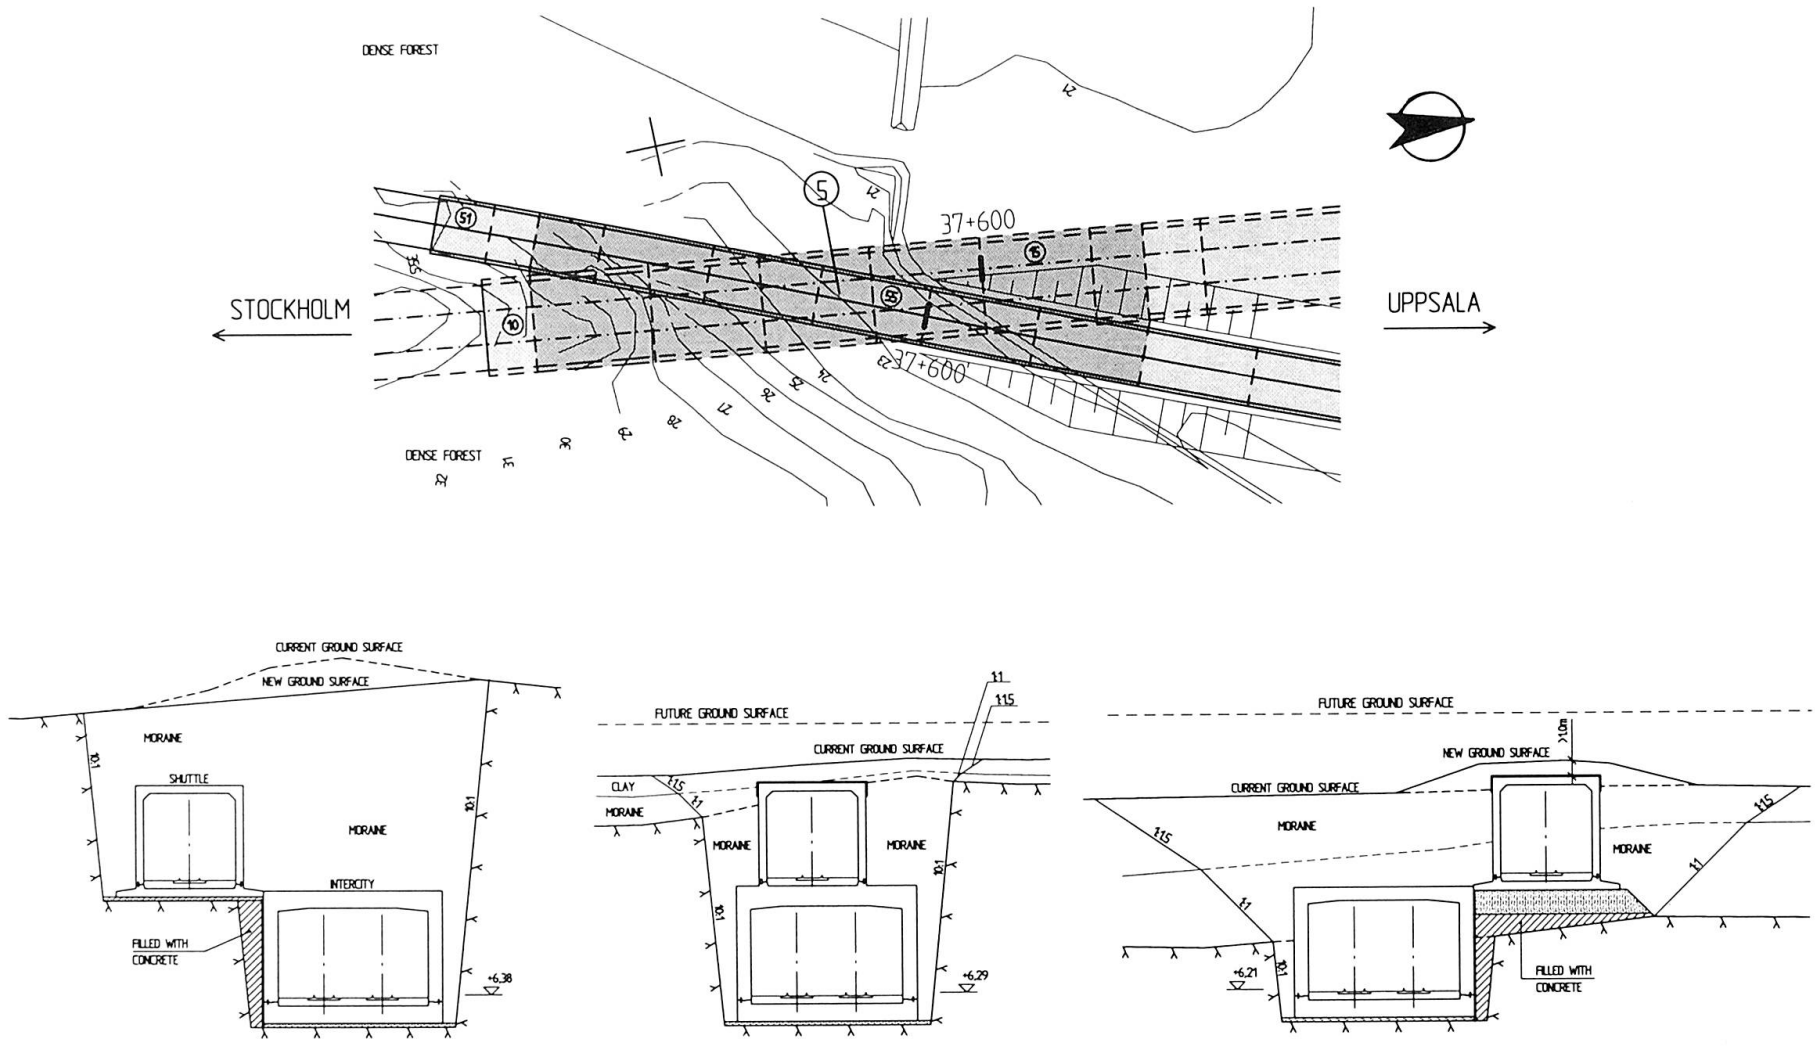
Over-crossing concrete tunnels at Märstaån in Arlandabanan - A plan view (upper) and three typical sections (lower).
